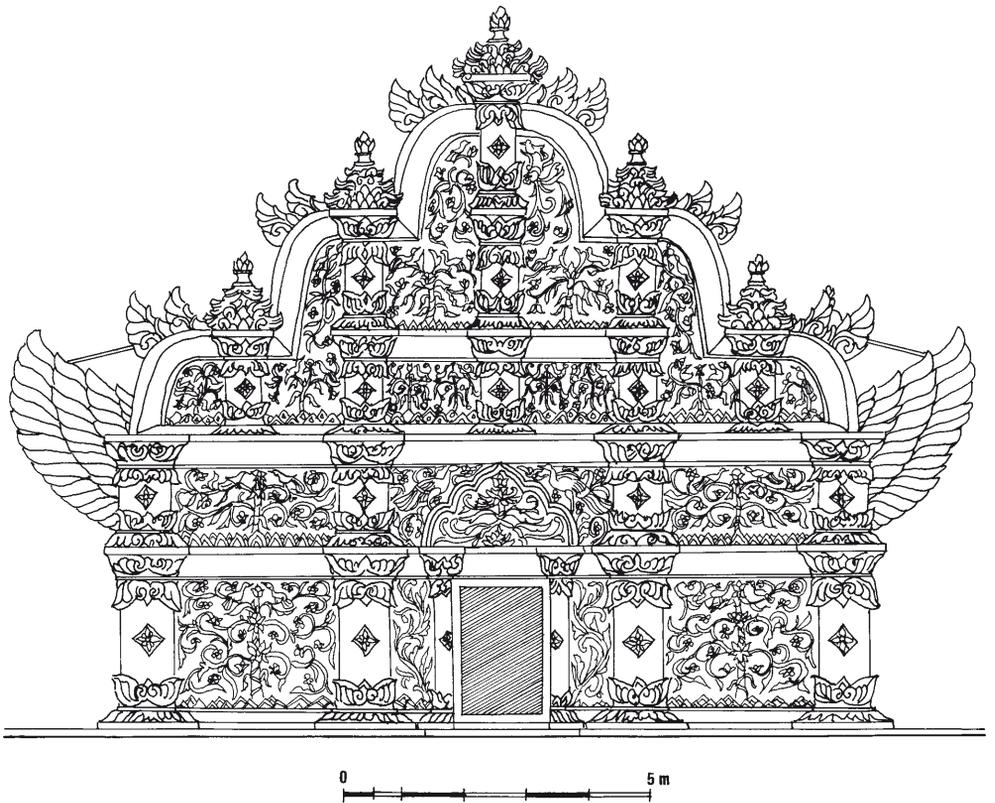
Yogyakarta, Taman Sari, elevation of pavilion 8.
